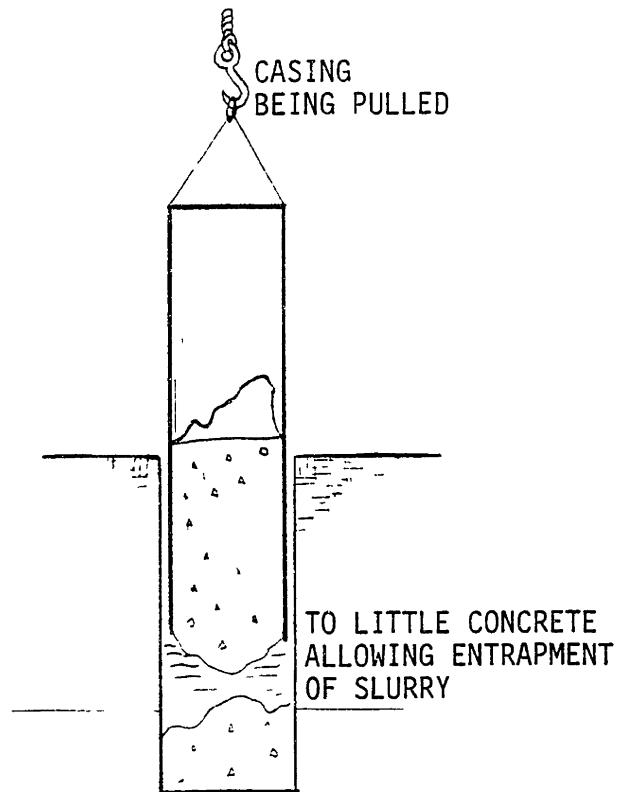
CONSTRUCTION PROBLEMS (ADAPTED FROM WINTERKORN AND FANG 1975)
